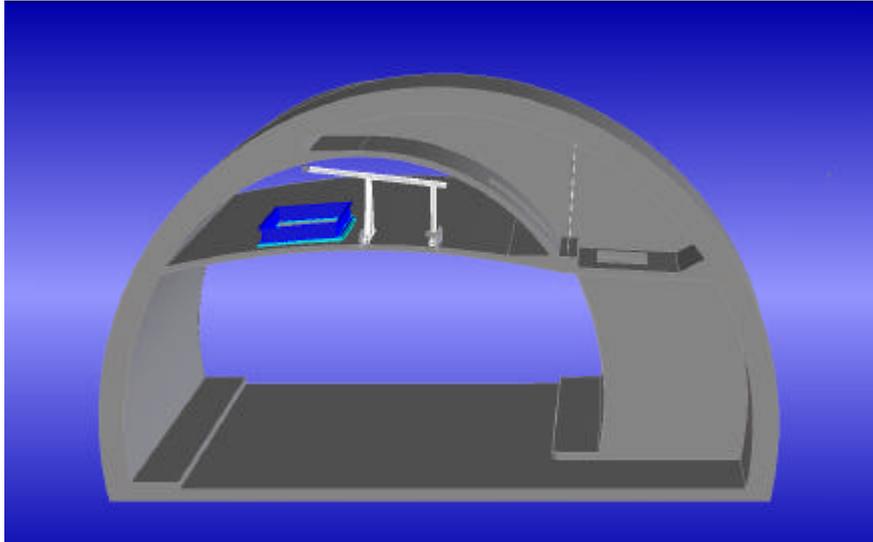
Three-Dimensional CAD Representation of Damper Installation
